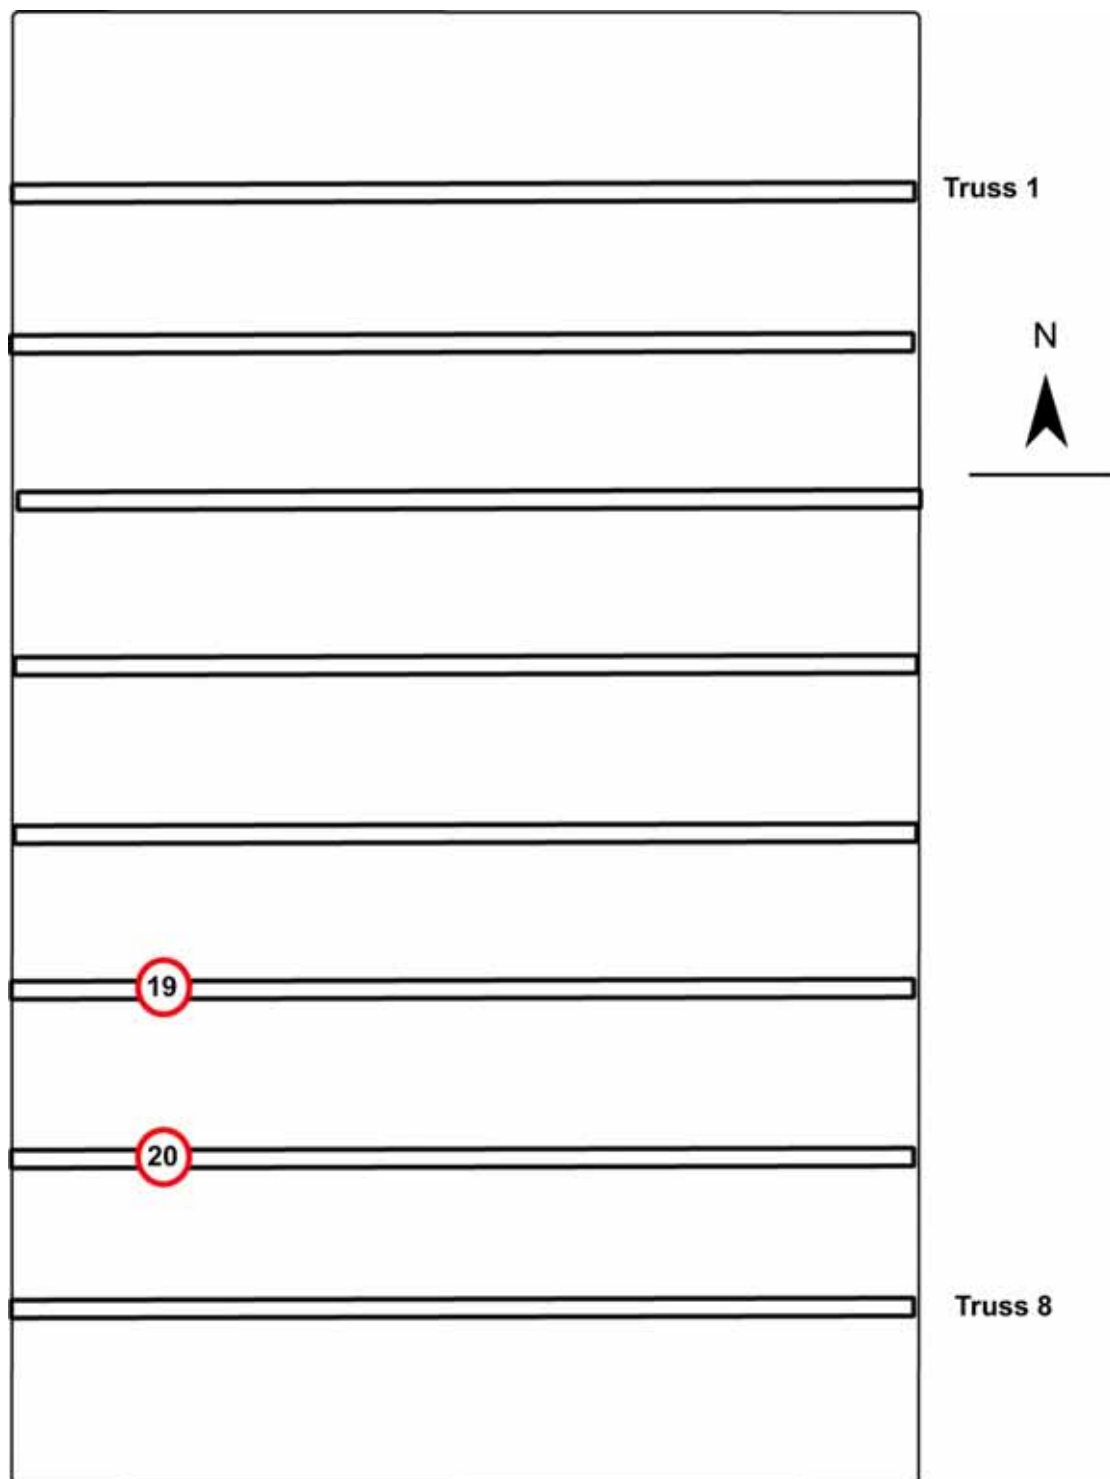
Plan of first floor of the malthouse to show sampled timbers
